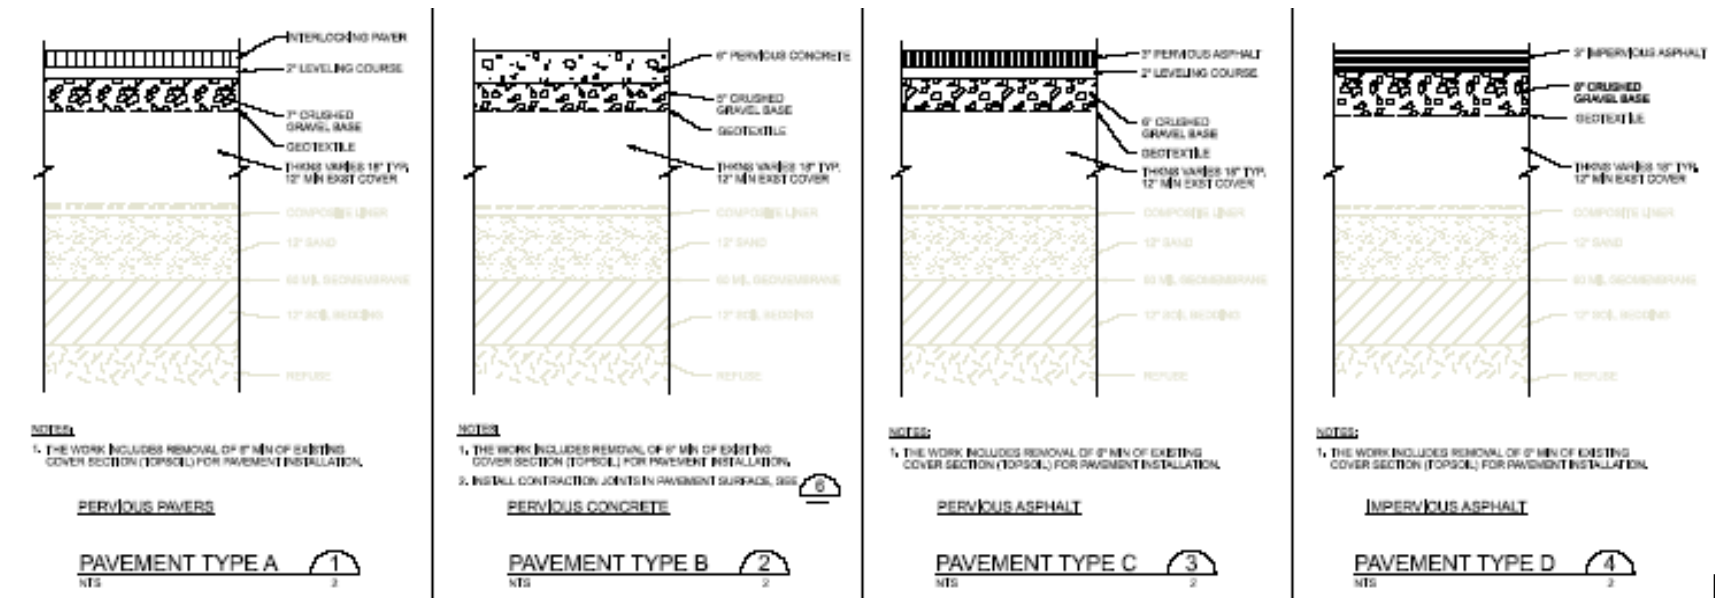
Typical Cross Section for Standard Asphalt and Pervious Pavements
